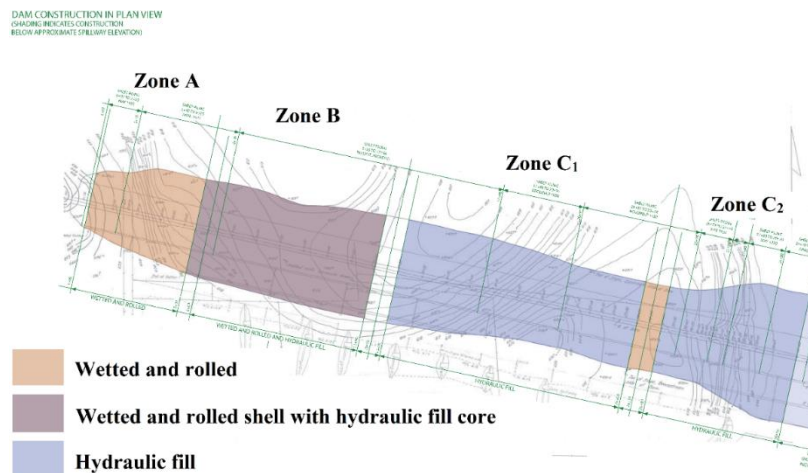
Plan view of dam showing the different zones based on the method of construction
